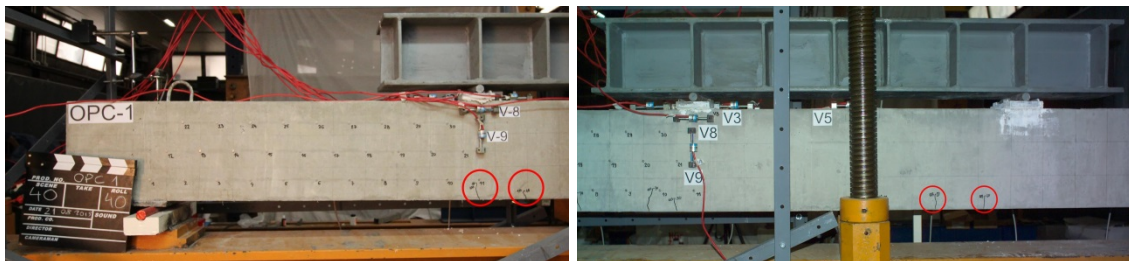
The first flexural crack in a) OPC-1 and b) HVFAC-1 beams
